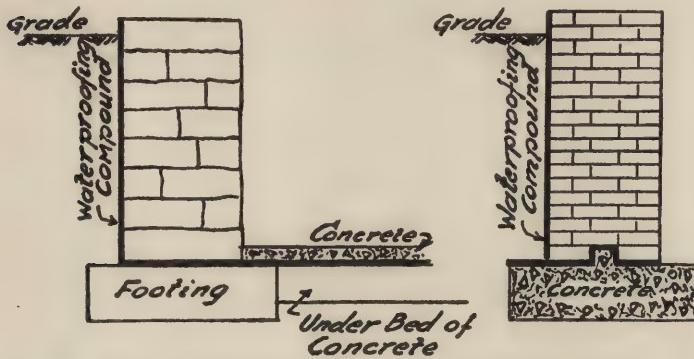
One method of Waterproofing Stone and Brick Buildings.
